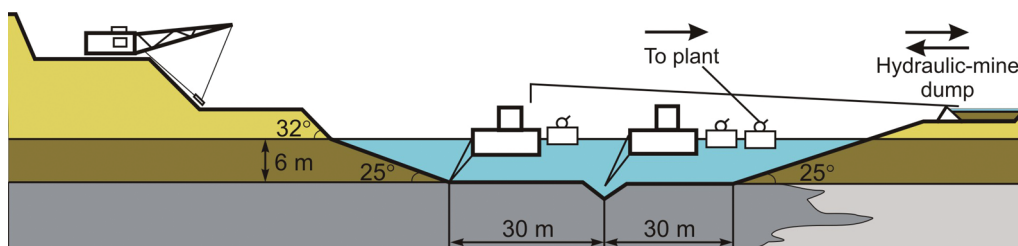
The scheme of excavation of flooded Sarmatian sands and ore with dredges
